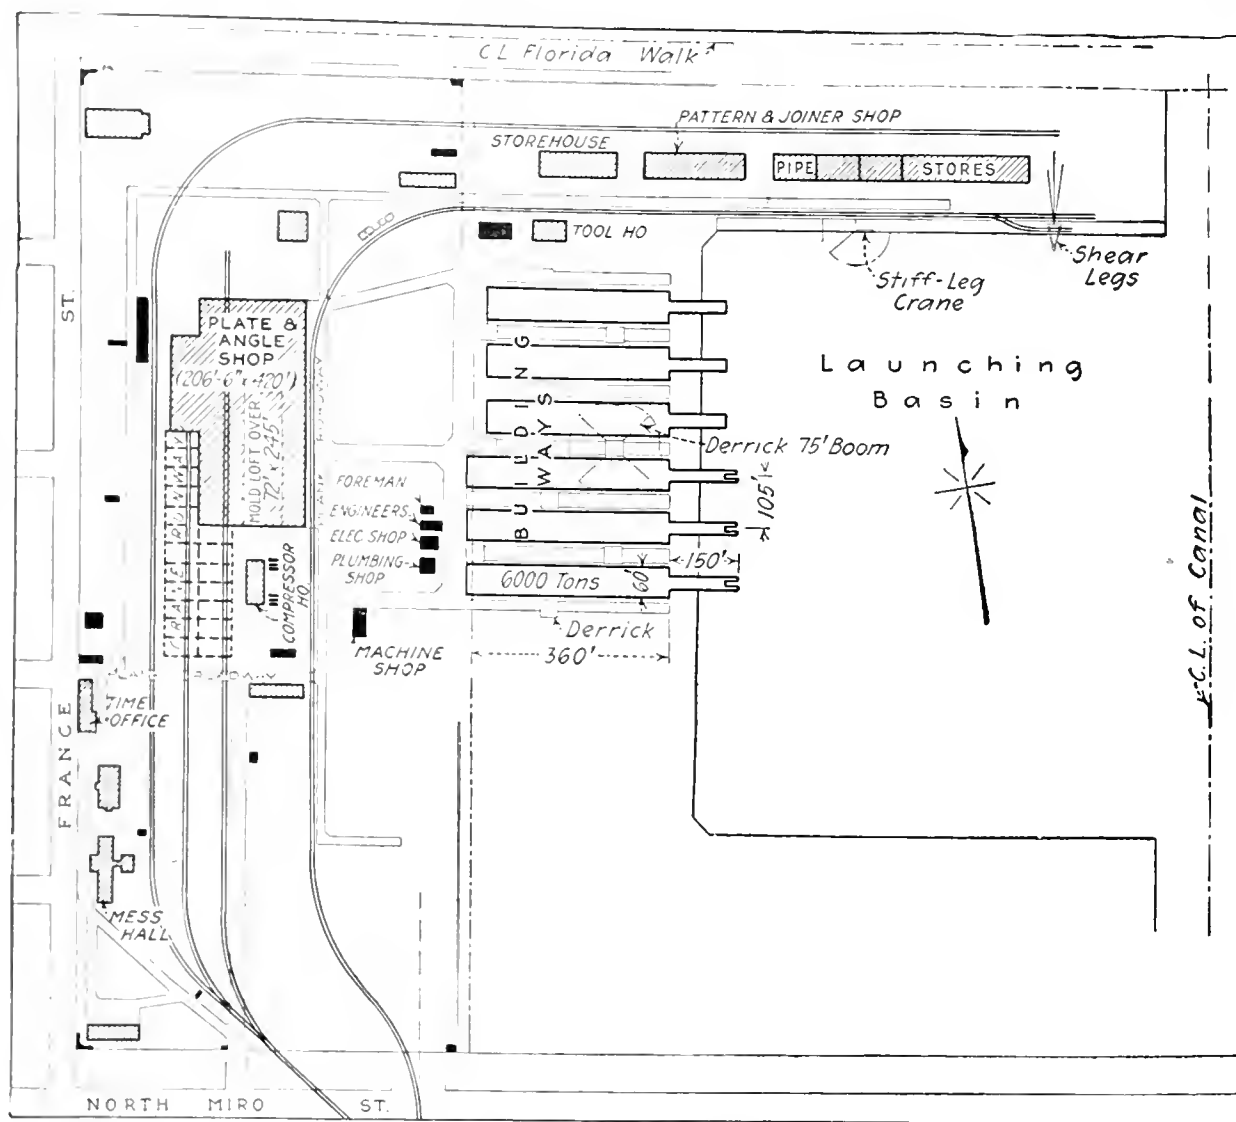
PLAN OF YARD—FIVE END-LAUNCHING WAYS; LARGE STORAGE SPACE BETWEEN SHOP AND WAYS
